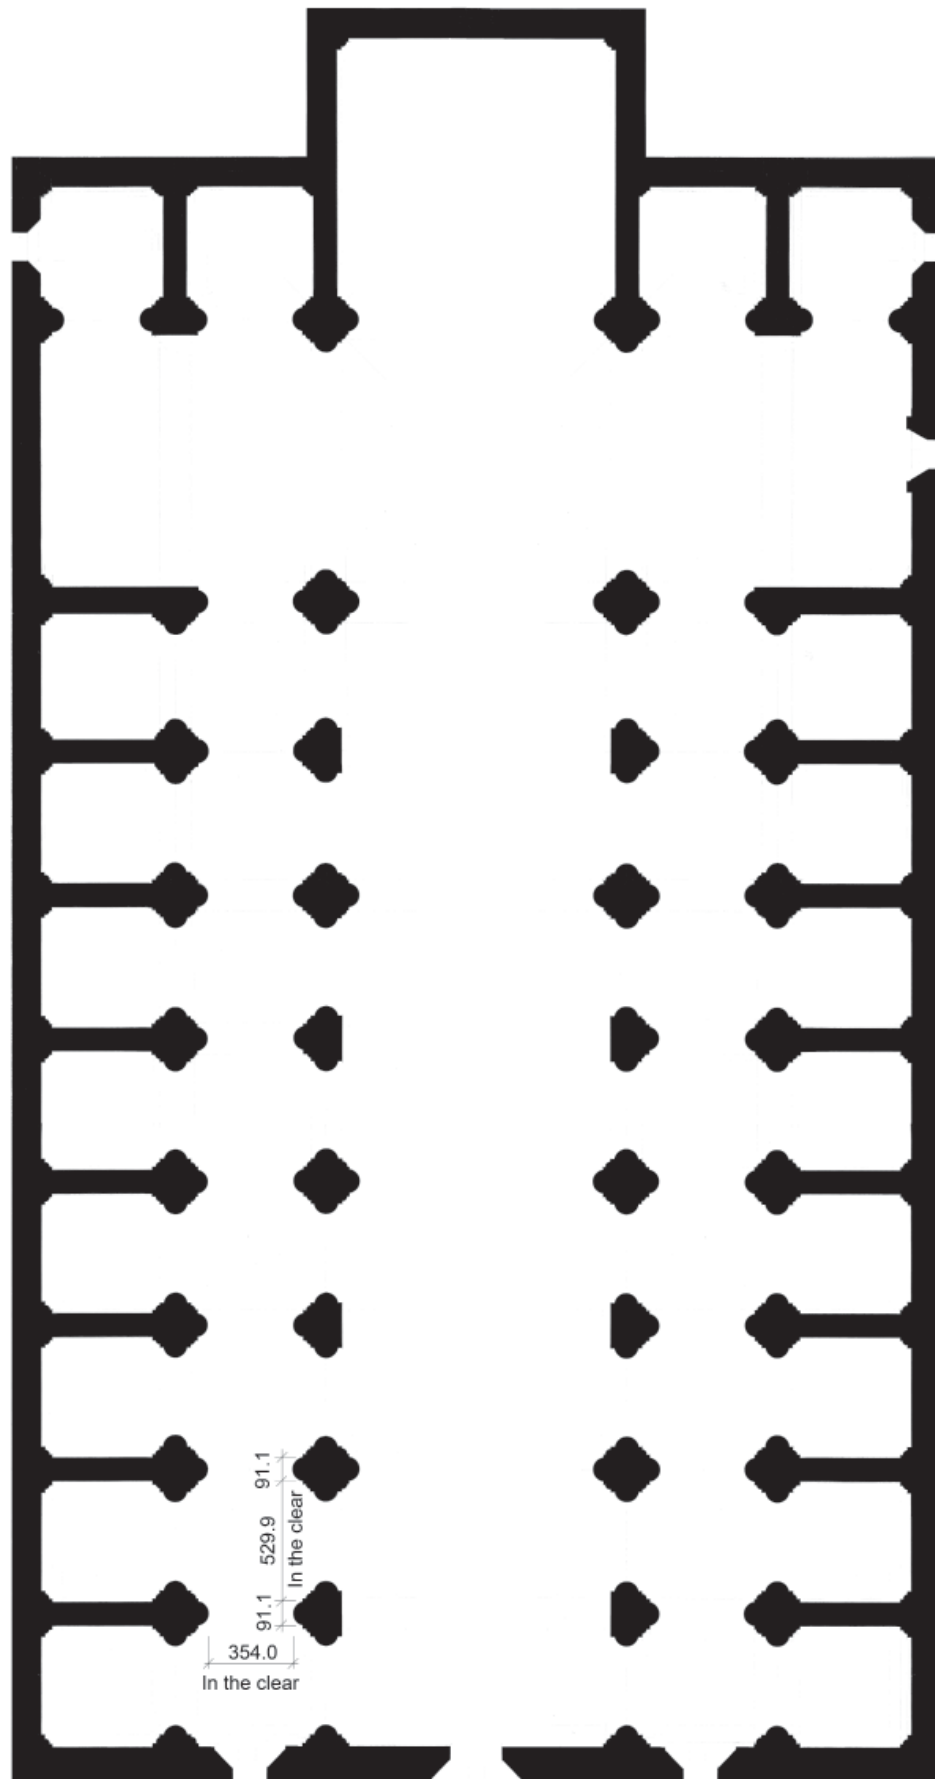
Basilica of Santa Maria del Carmine, Pavia, floor plan (author).
